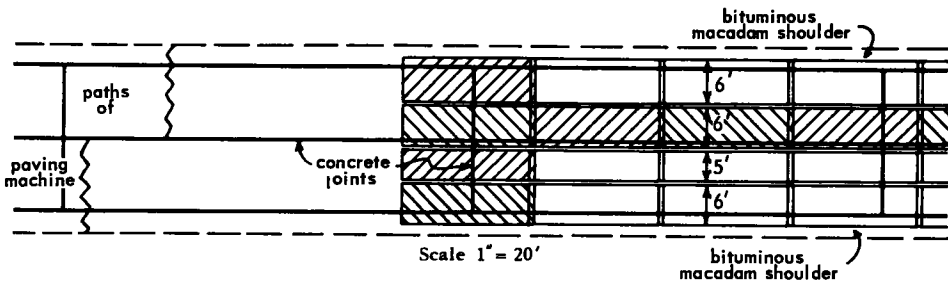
Placement of fabric on road. Continuous reinforcing with sheet fabric.
